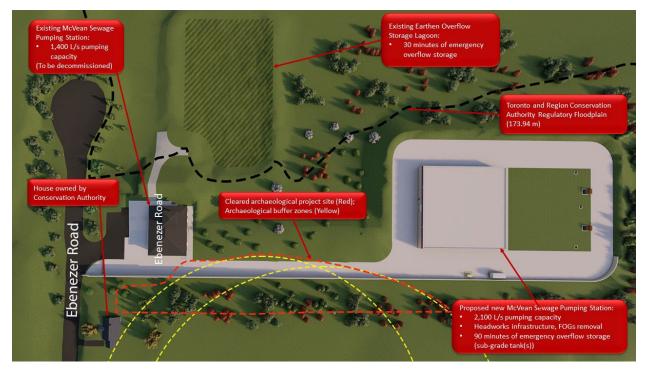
Layout Plan of the Preferred Alternative for the McVean SPS Project
